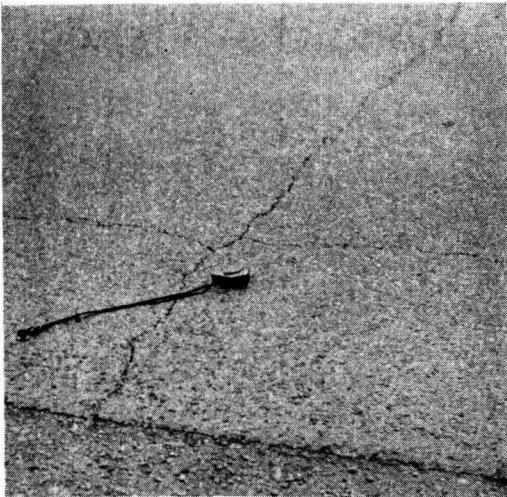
Longitudinal and transverse cracking over asphaltic concrete pavement.
